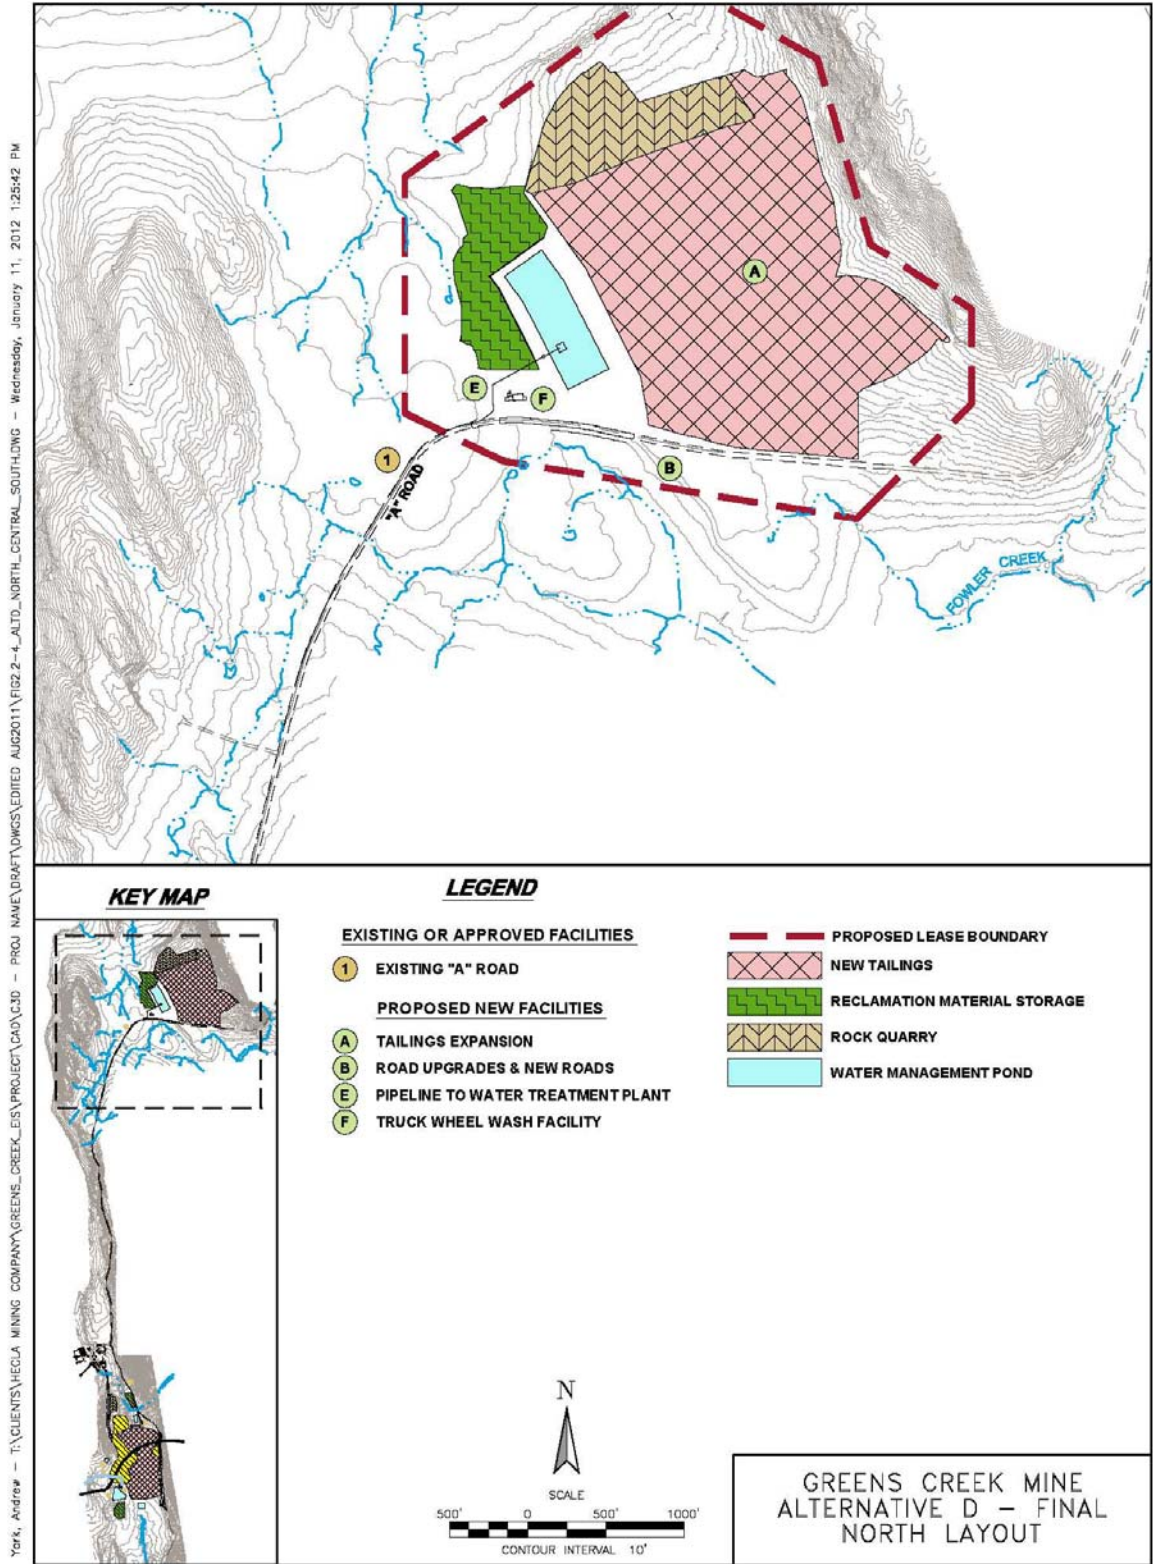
Greens Creek Mine Alternative D – Final North Layout.
